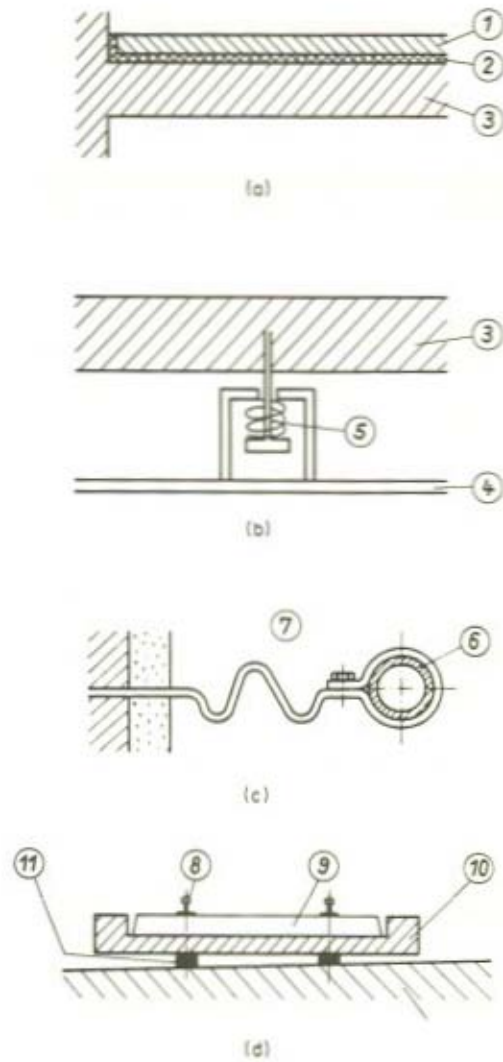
Application of resilient layers. (a) Floating floor; (b) Suspended ceiling on springs; (c) Flexible pipe clamp; (d) Resilient track mounting. (1) floating floor, (2) fibrous material mounting, (3) structural floor, (4) suspended ceiling, (5) spring, (6) pipe, (7) resilient clamp, (8) rail, (9) sleeper, (10) heavy concrete beam, (11) elastomer mounts
